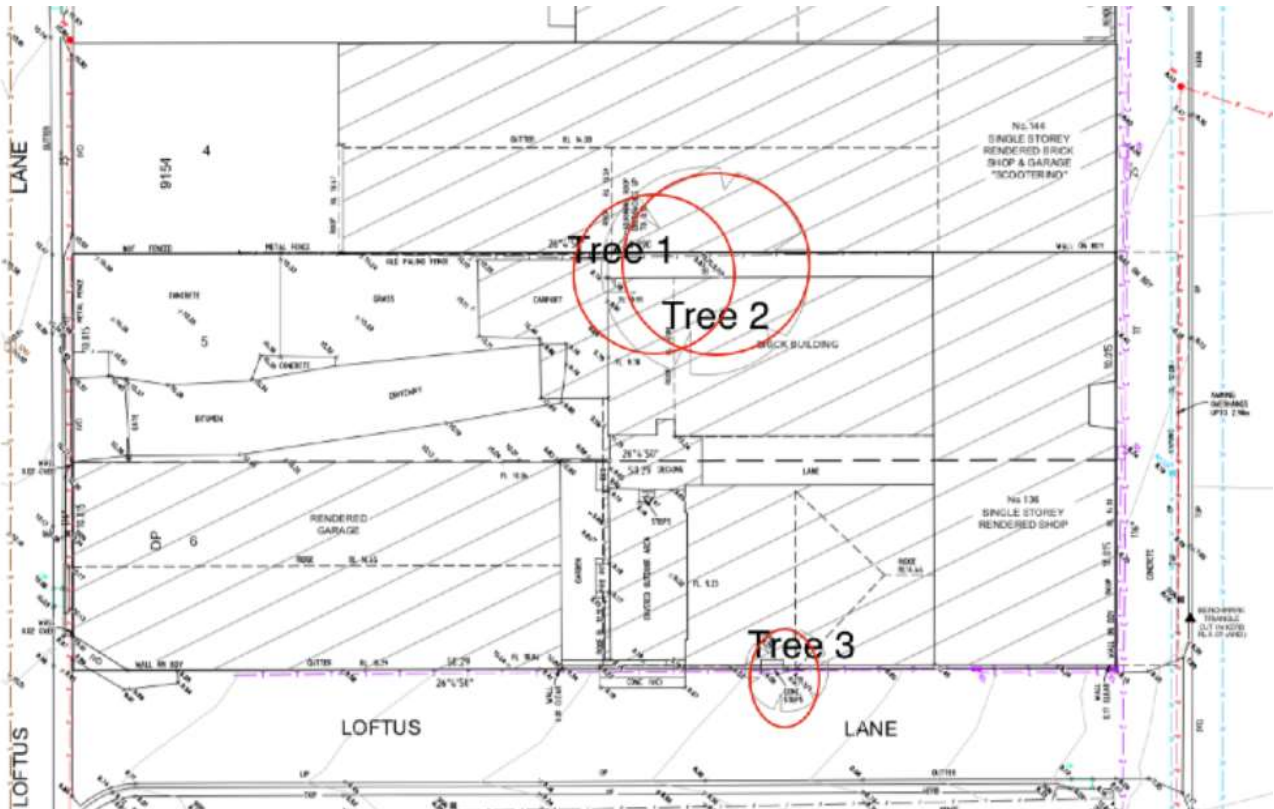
Plan of the subject site with the existing trees proposed to be removed outlined in red.
